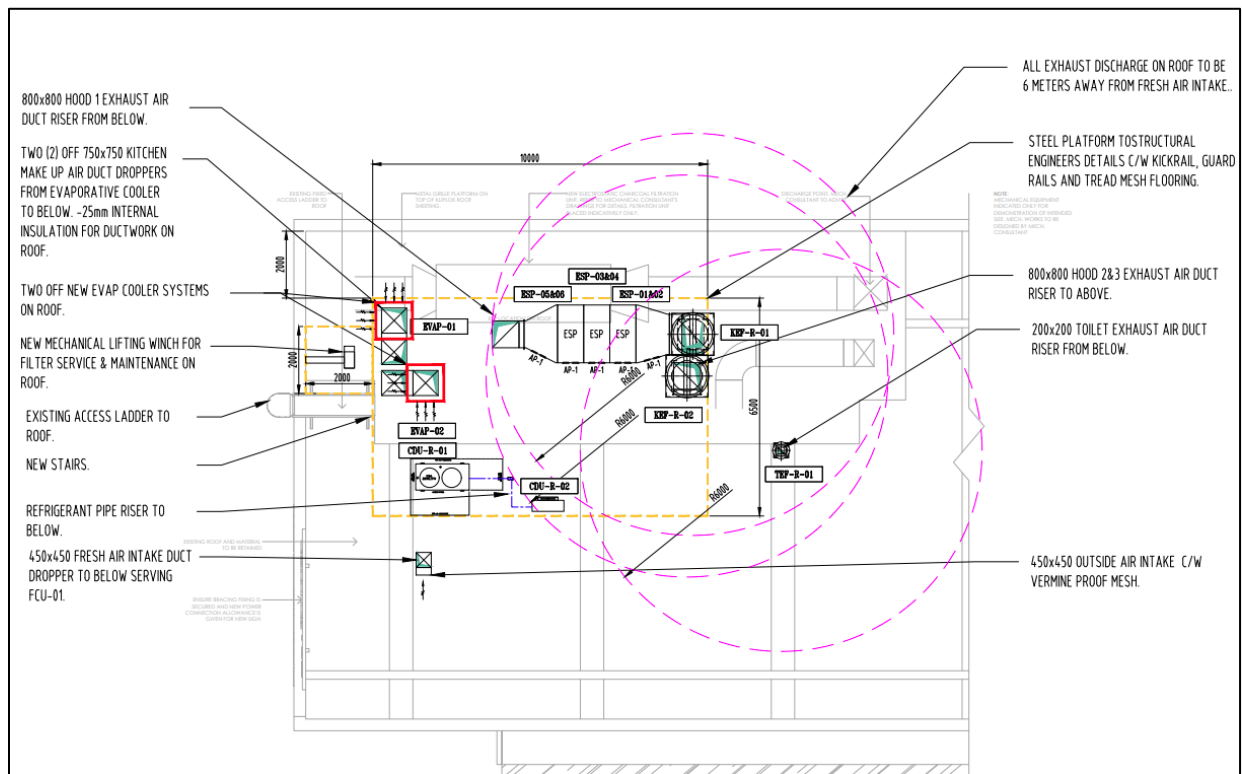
Proposed Charcoal Chicken Exhaust Stacks on the Roof Level
